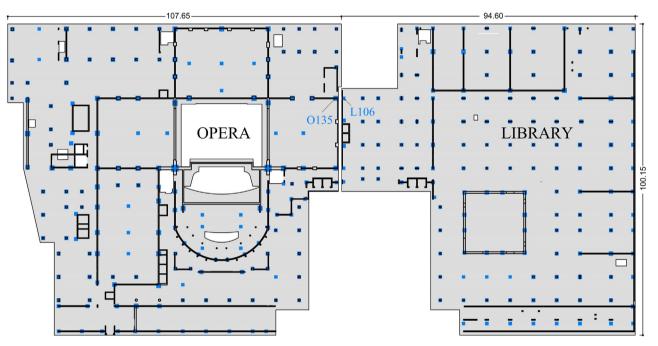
Plan layout of the ground floor of the Stavros Niarchos Foundation Cultural Center; underneath view with bearings' locations.
